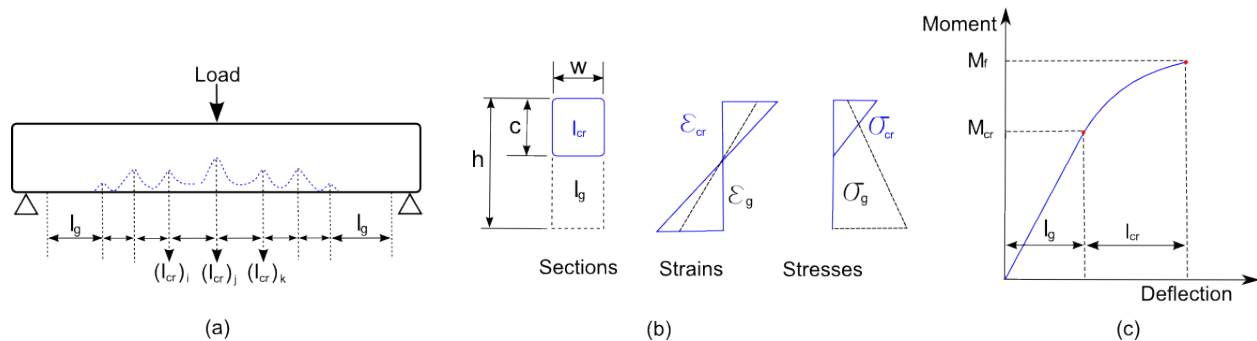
a) Change of second moment of area, b) strains and stress of a concrete beam, c) cracking moment.
